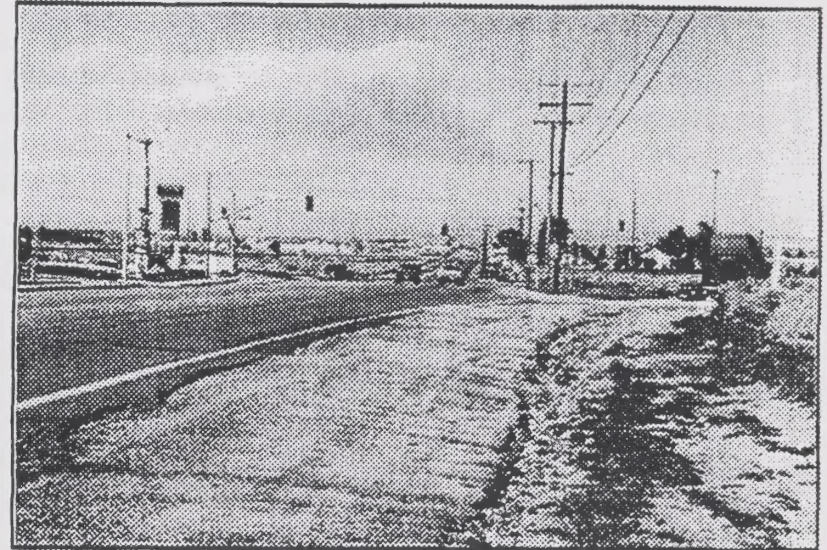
Intersection at Avenue S and Sierra Highway looking north.
